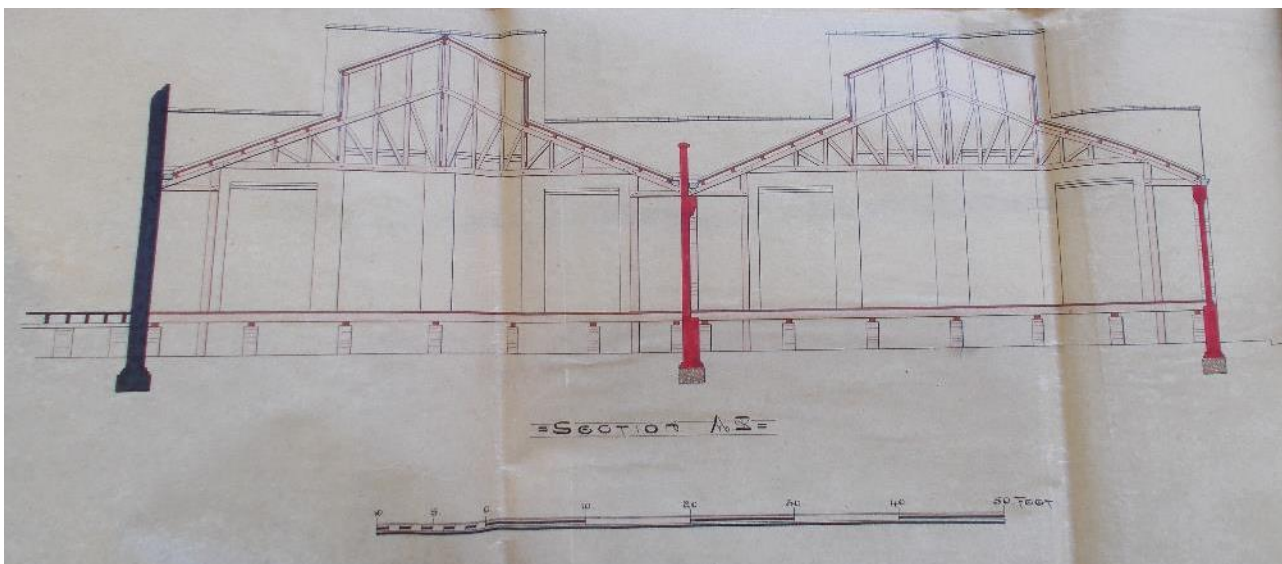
Proposed elevations dated June 1897 for buildings located on the site of the present Buildings 6 and 7
